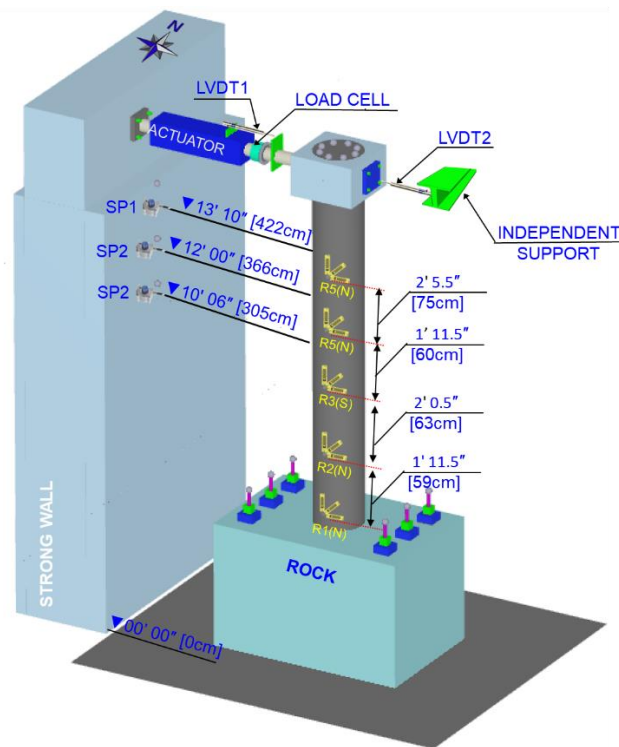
Completed test setup for specimen 1 testing without the sand
